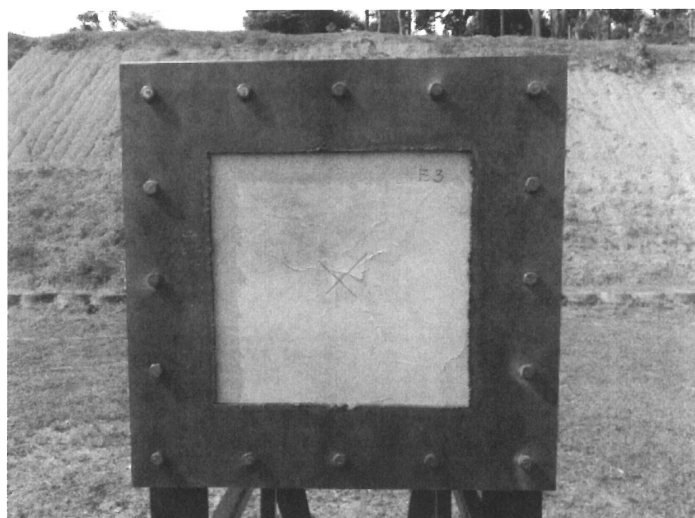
Crack pattern after explosion to steel plate with gypsum board with gap (Case 3)
